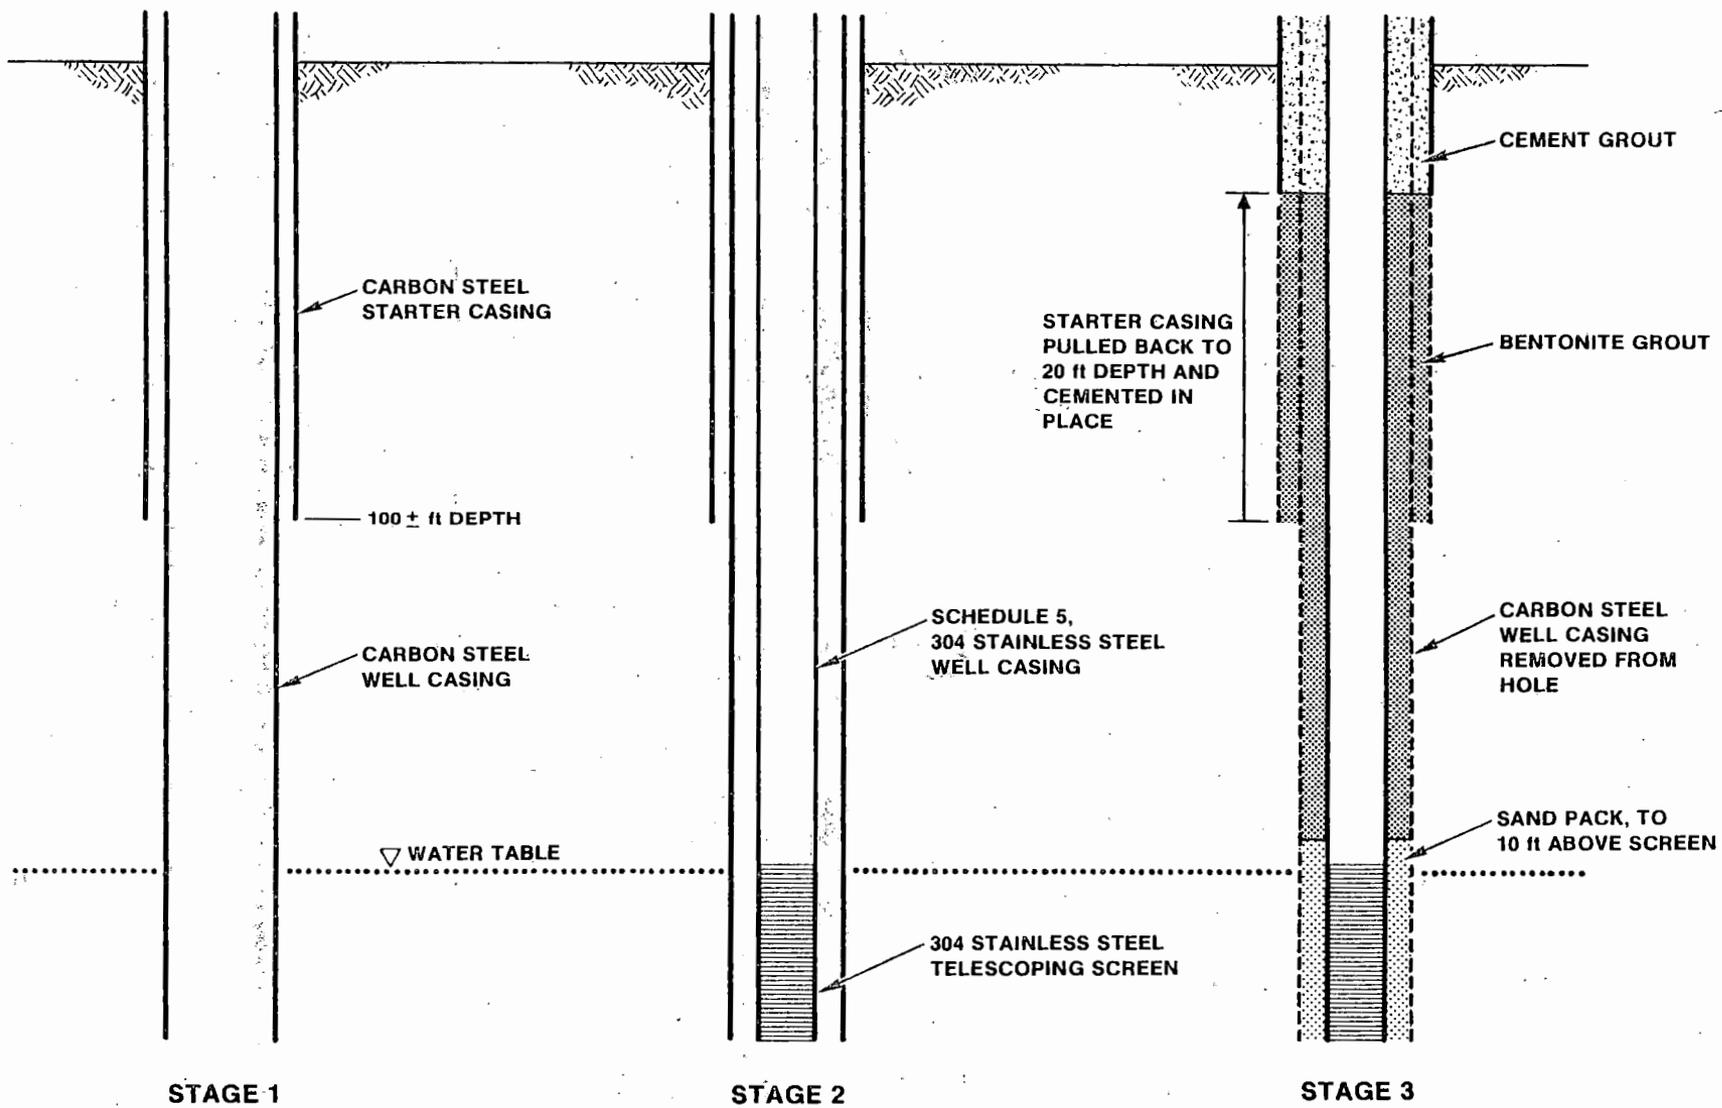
Idealized Cross-Sectional Views Depicting Well Construction ("New" Method).
